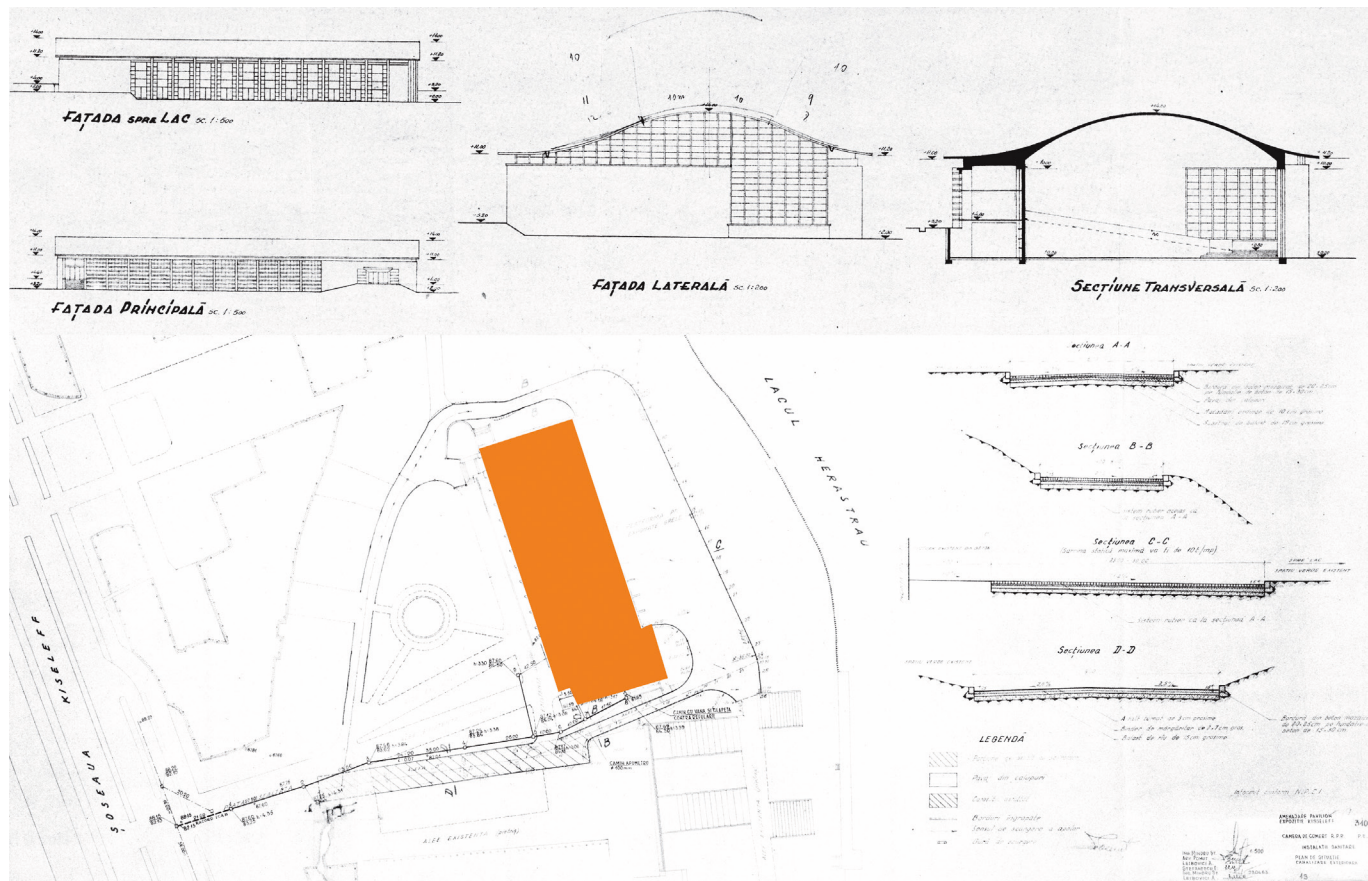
Pavilion H Facades, from the original drawing-section, siteplan. Source: Mihaela Criticos, inforom 5+5.
